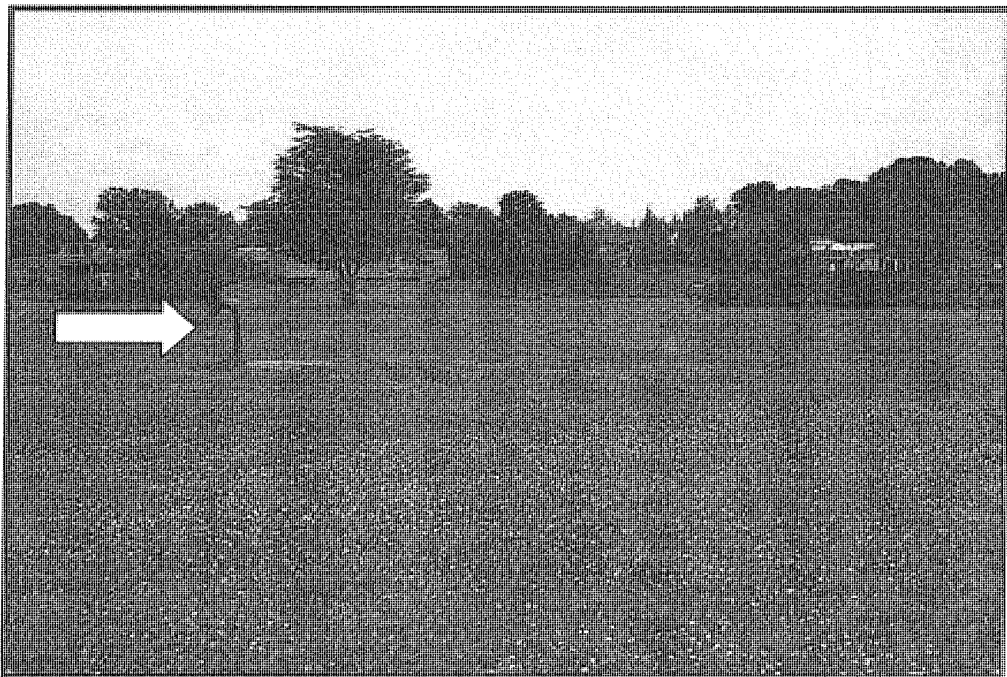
Vent pipe for underground hot water pipe system in Cottage Complex.
